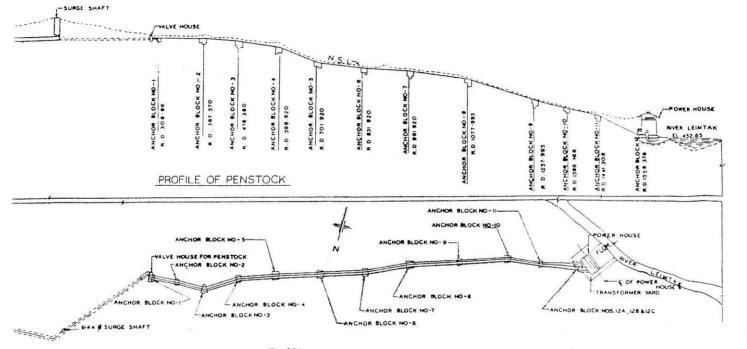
Plan and Profile of Penstock (Loktak H.E. Project)
